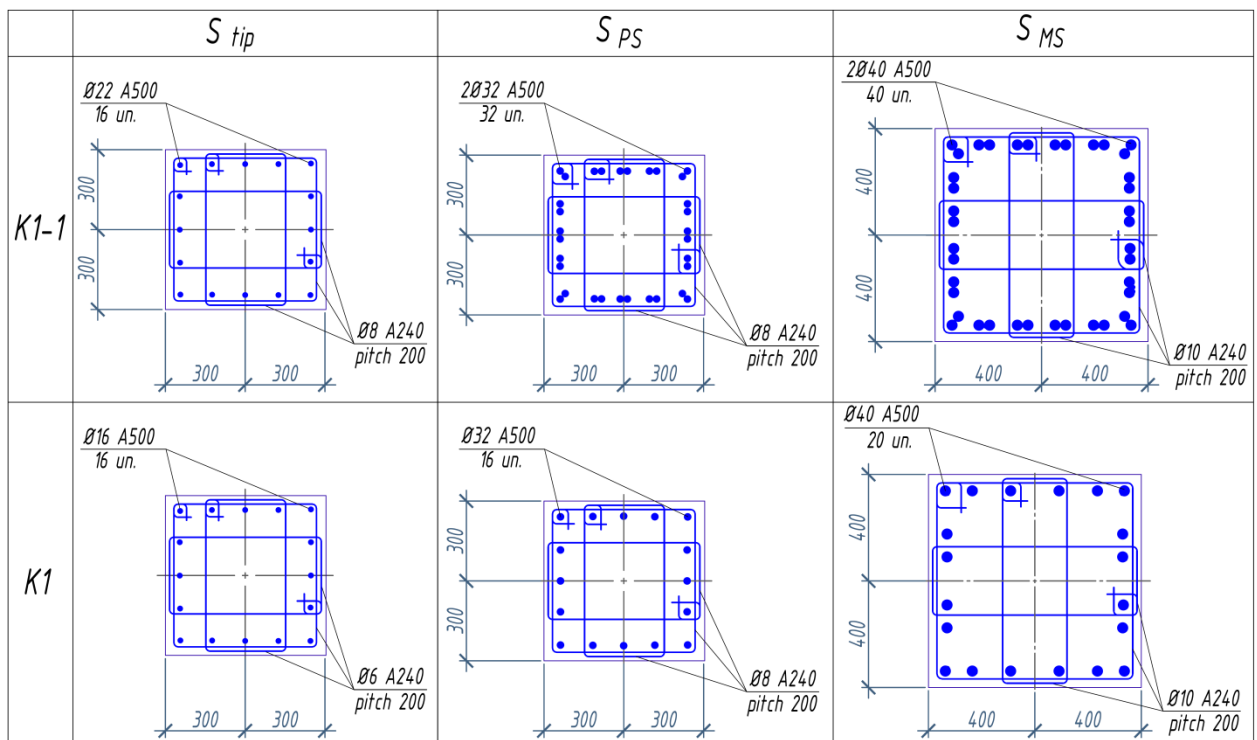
Data on reinforcement for sections of the reinforced concrete columns K1, K1-1
